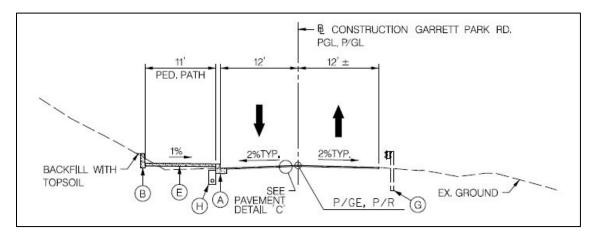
Proposed Typical Cross Section – Stations 10+61 to 11+58
